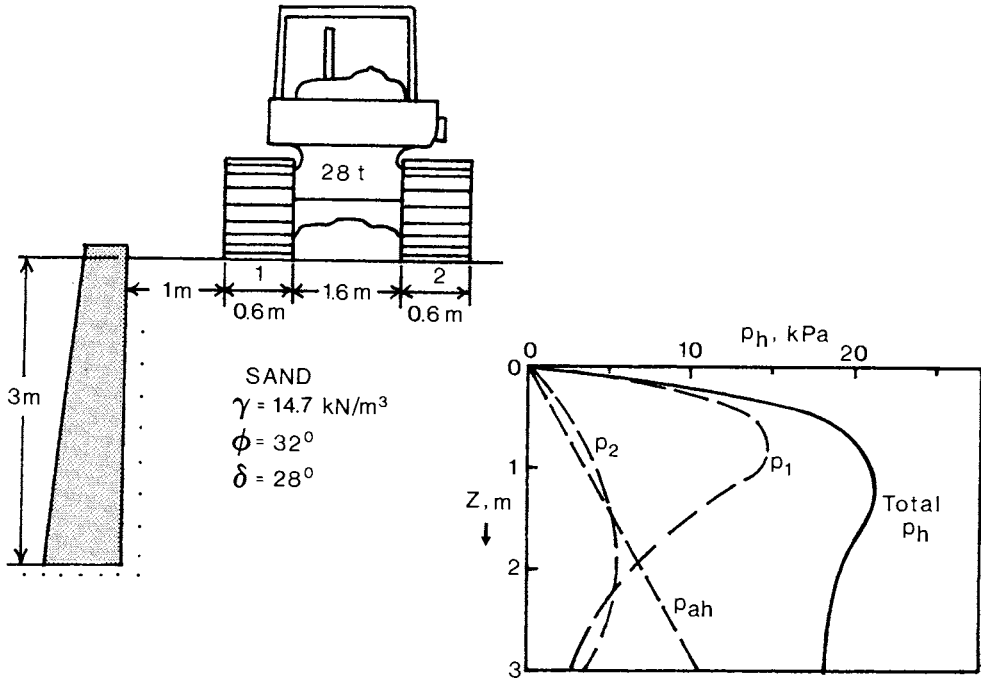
Surcharge load for Problem 6.3 and the resulting pressure distribution on the retaining wall.
